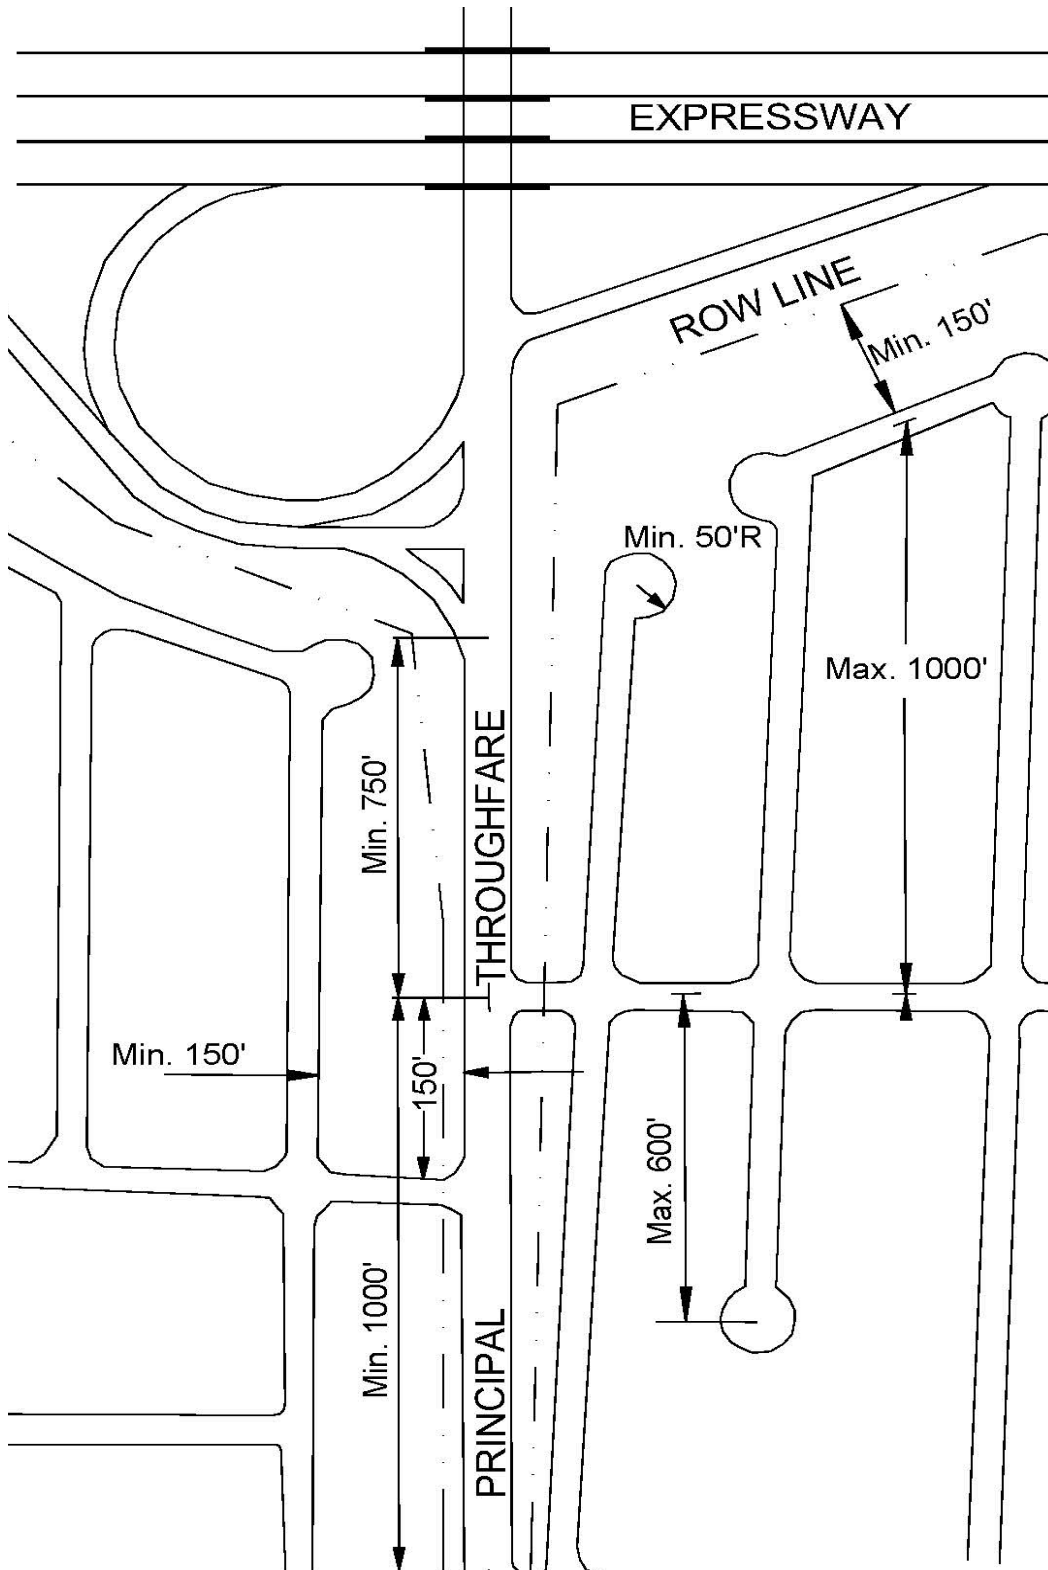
STREET AND BLOCK LAYOUT STANDARDS
